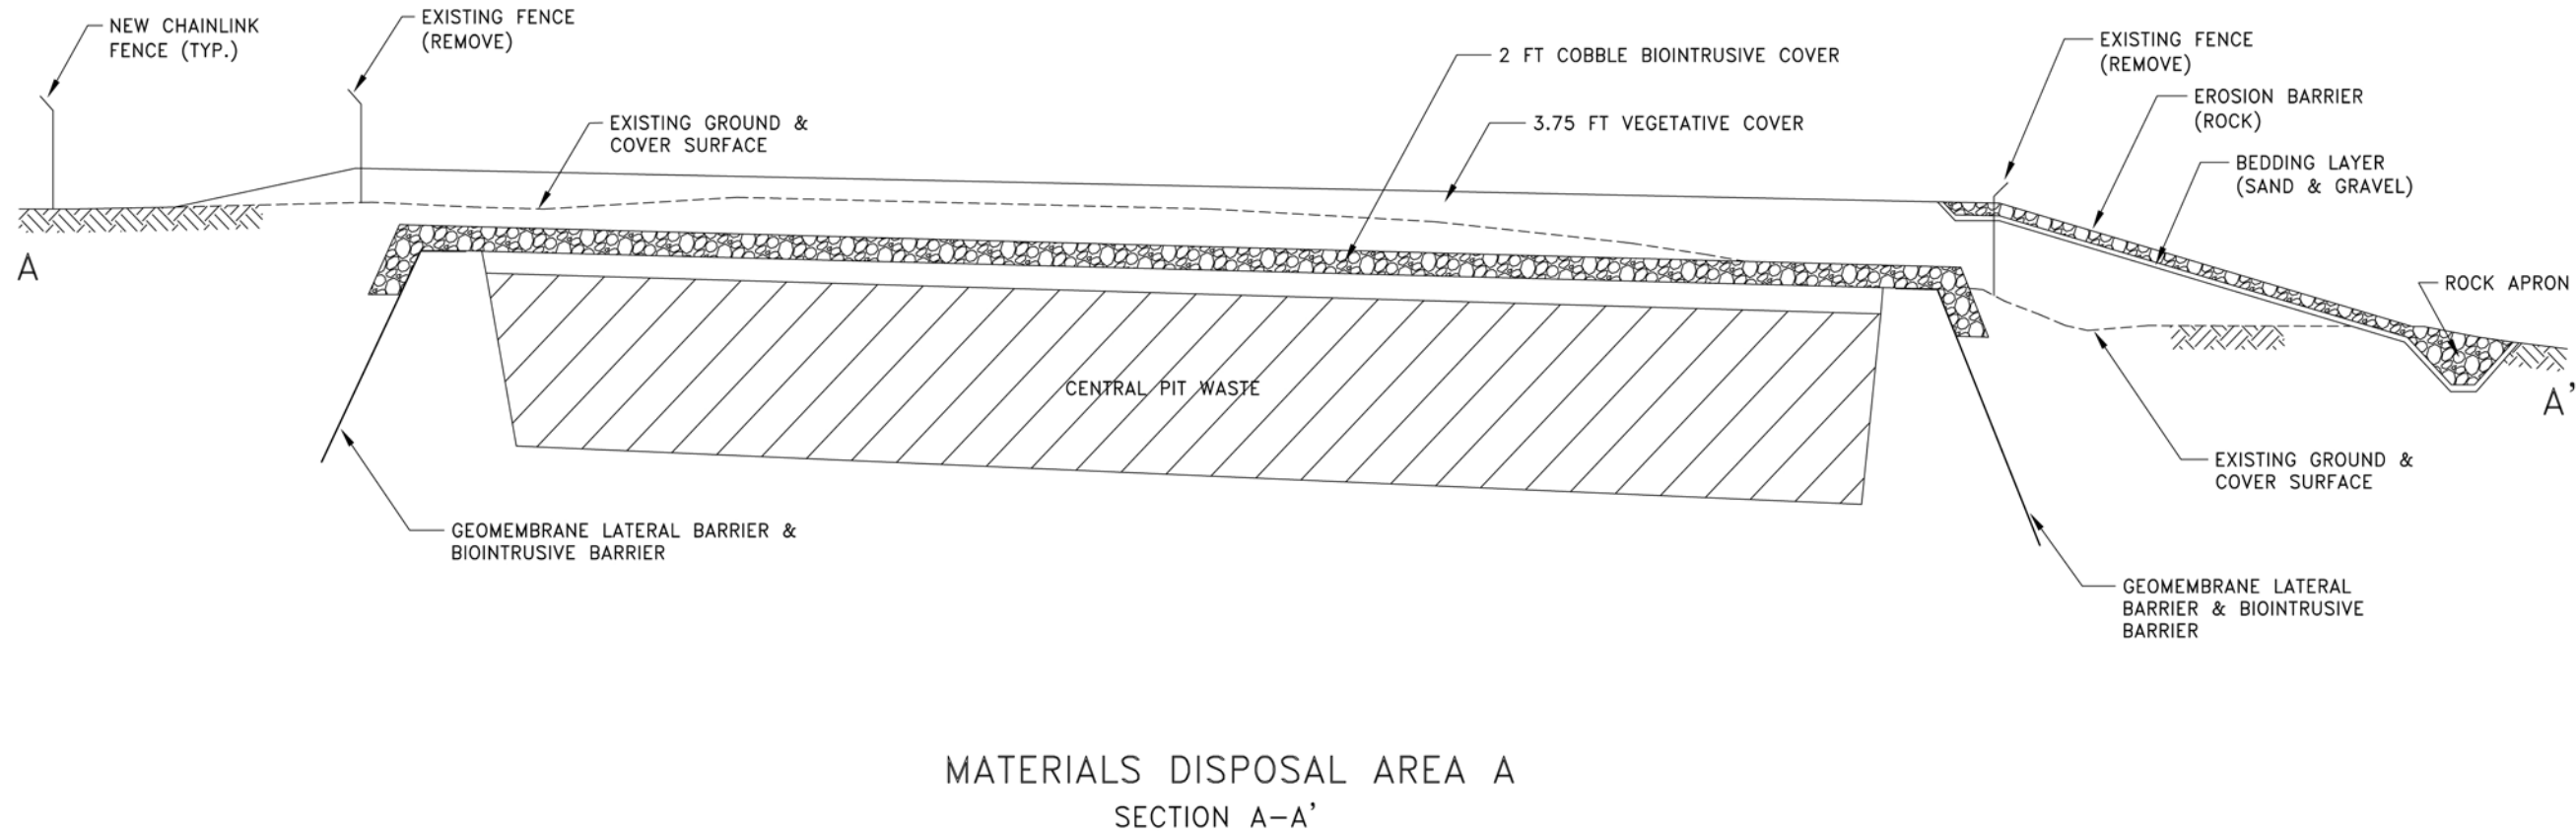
Alternative 2, cross section of MDA A with ET cover
